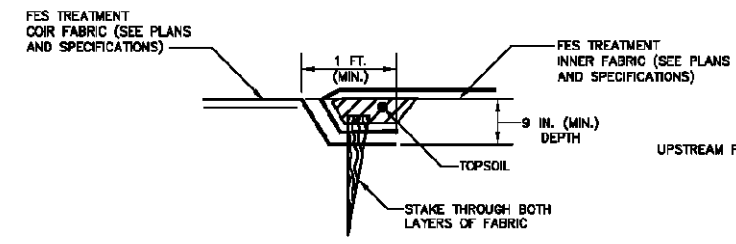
DETAILS: WOODEN STAKE CONSTRUCTION (C)
